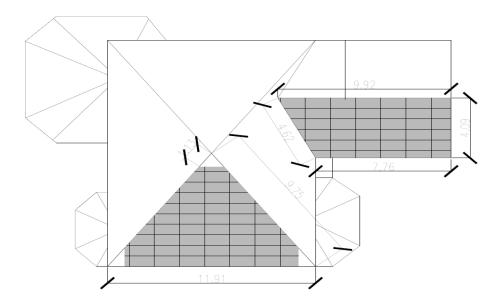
The roof plan of the example dwelling unit integrated with BIPV roof tiles facing South.
